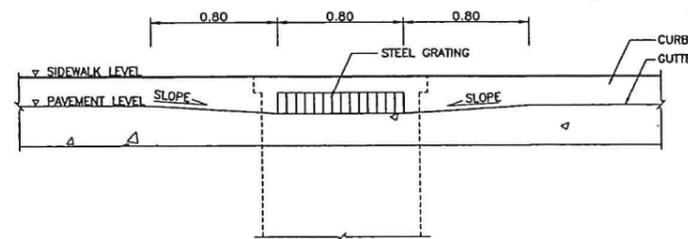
DETAIL OF CURB AND GUTTER OR CURB AT RAISED MEDIAN
